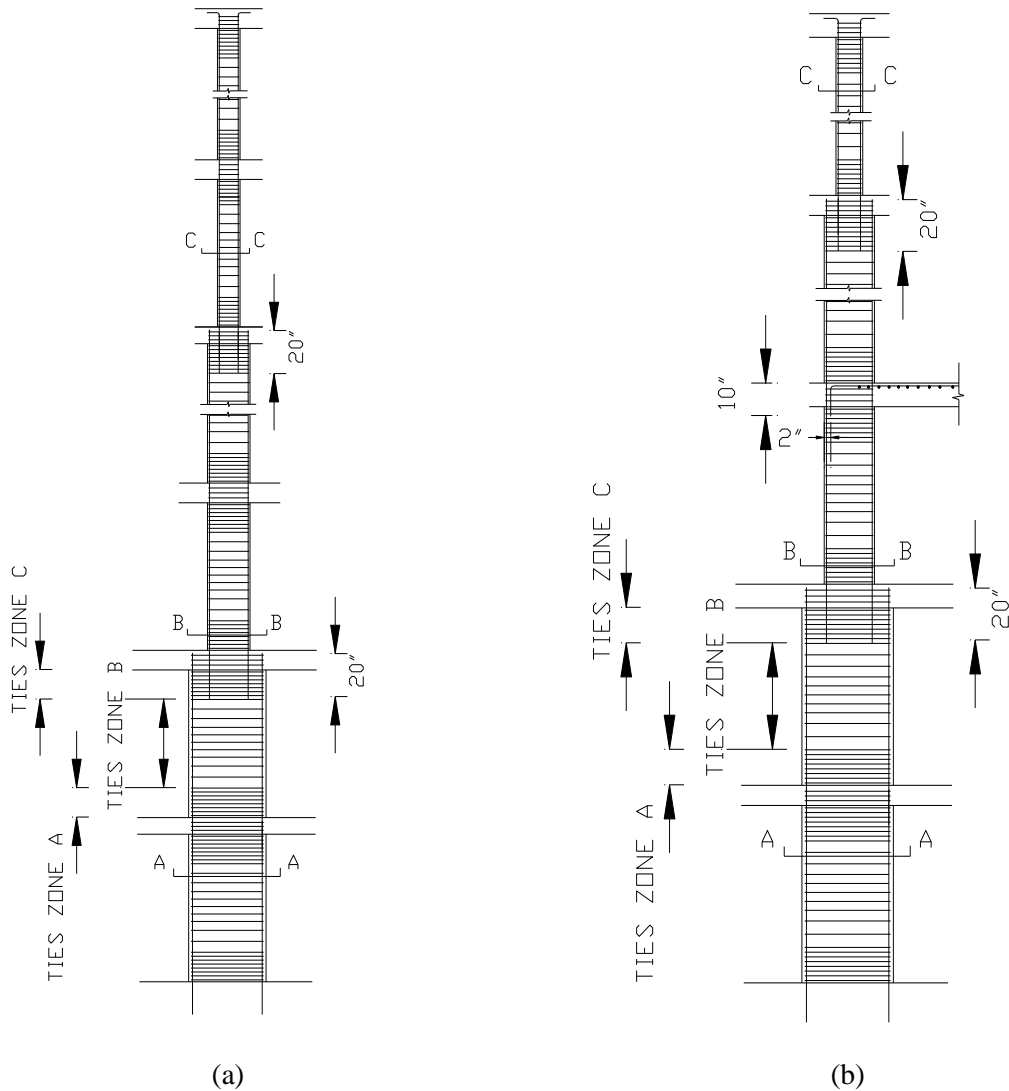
(a) Reinforcement details of central column, (b) Reinforcement details of column with stair connection
